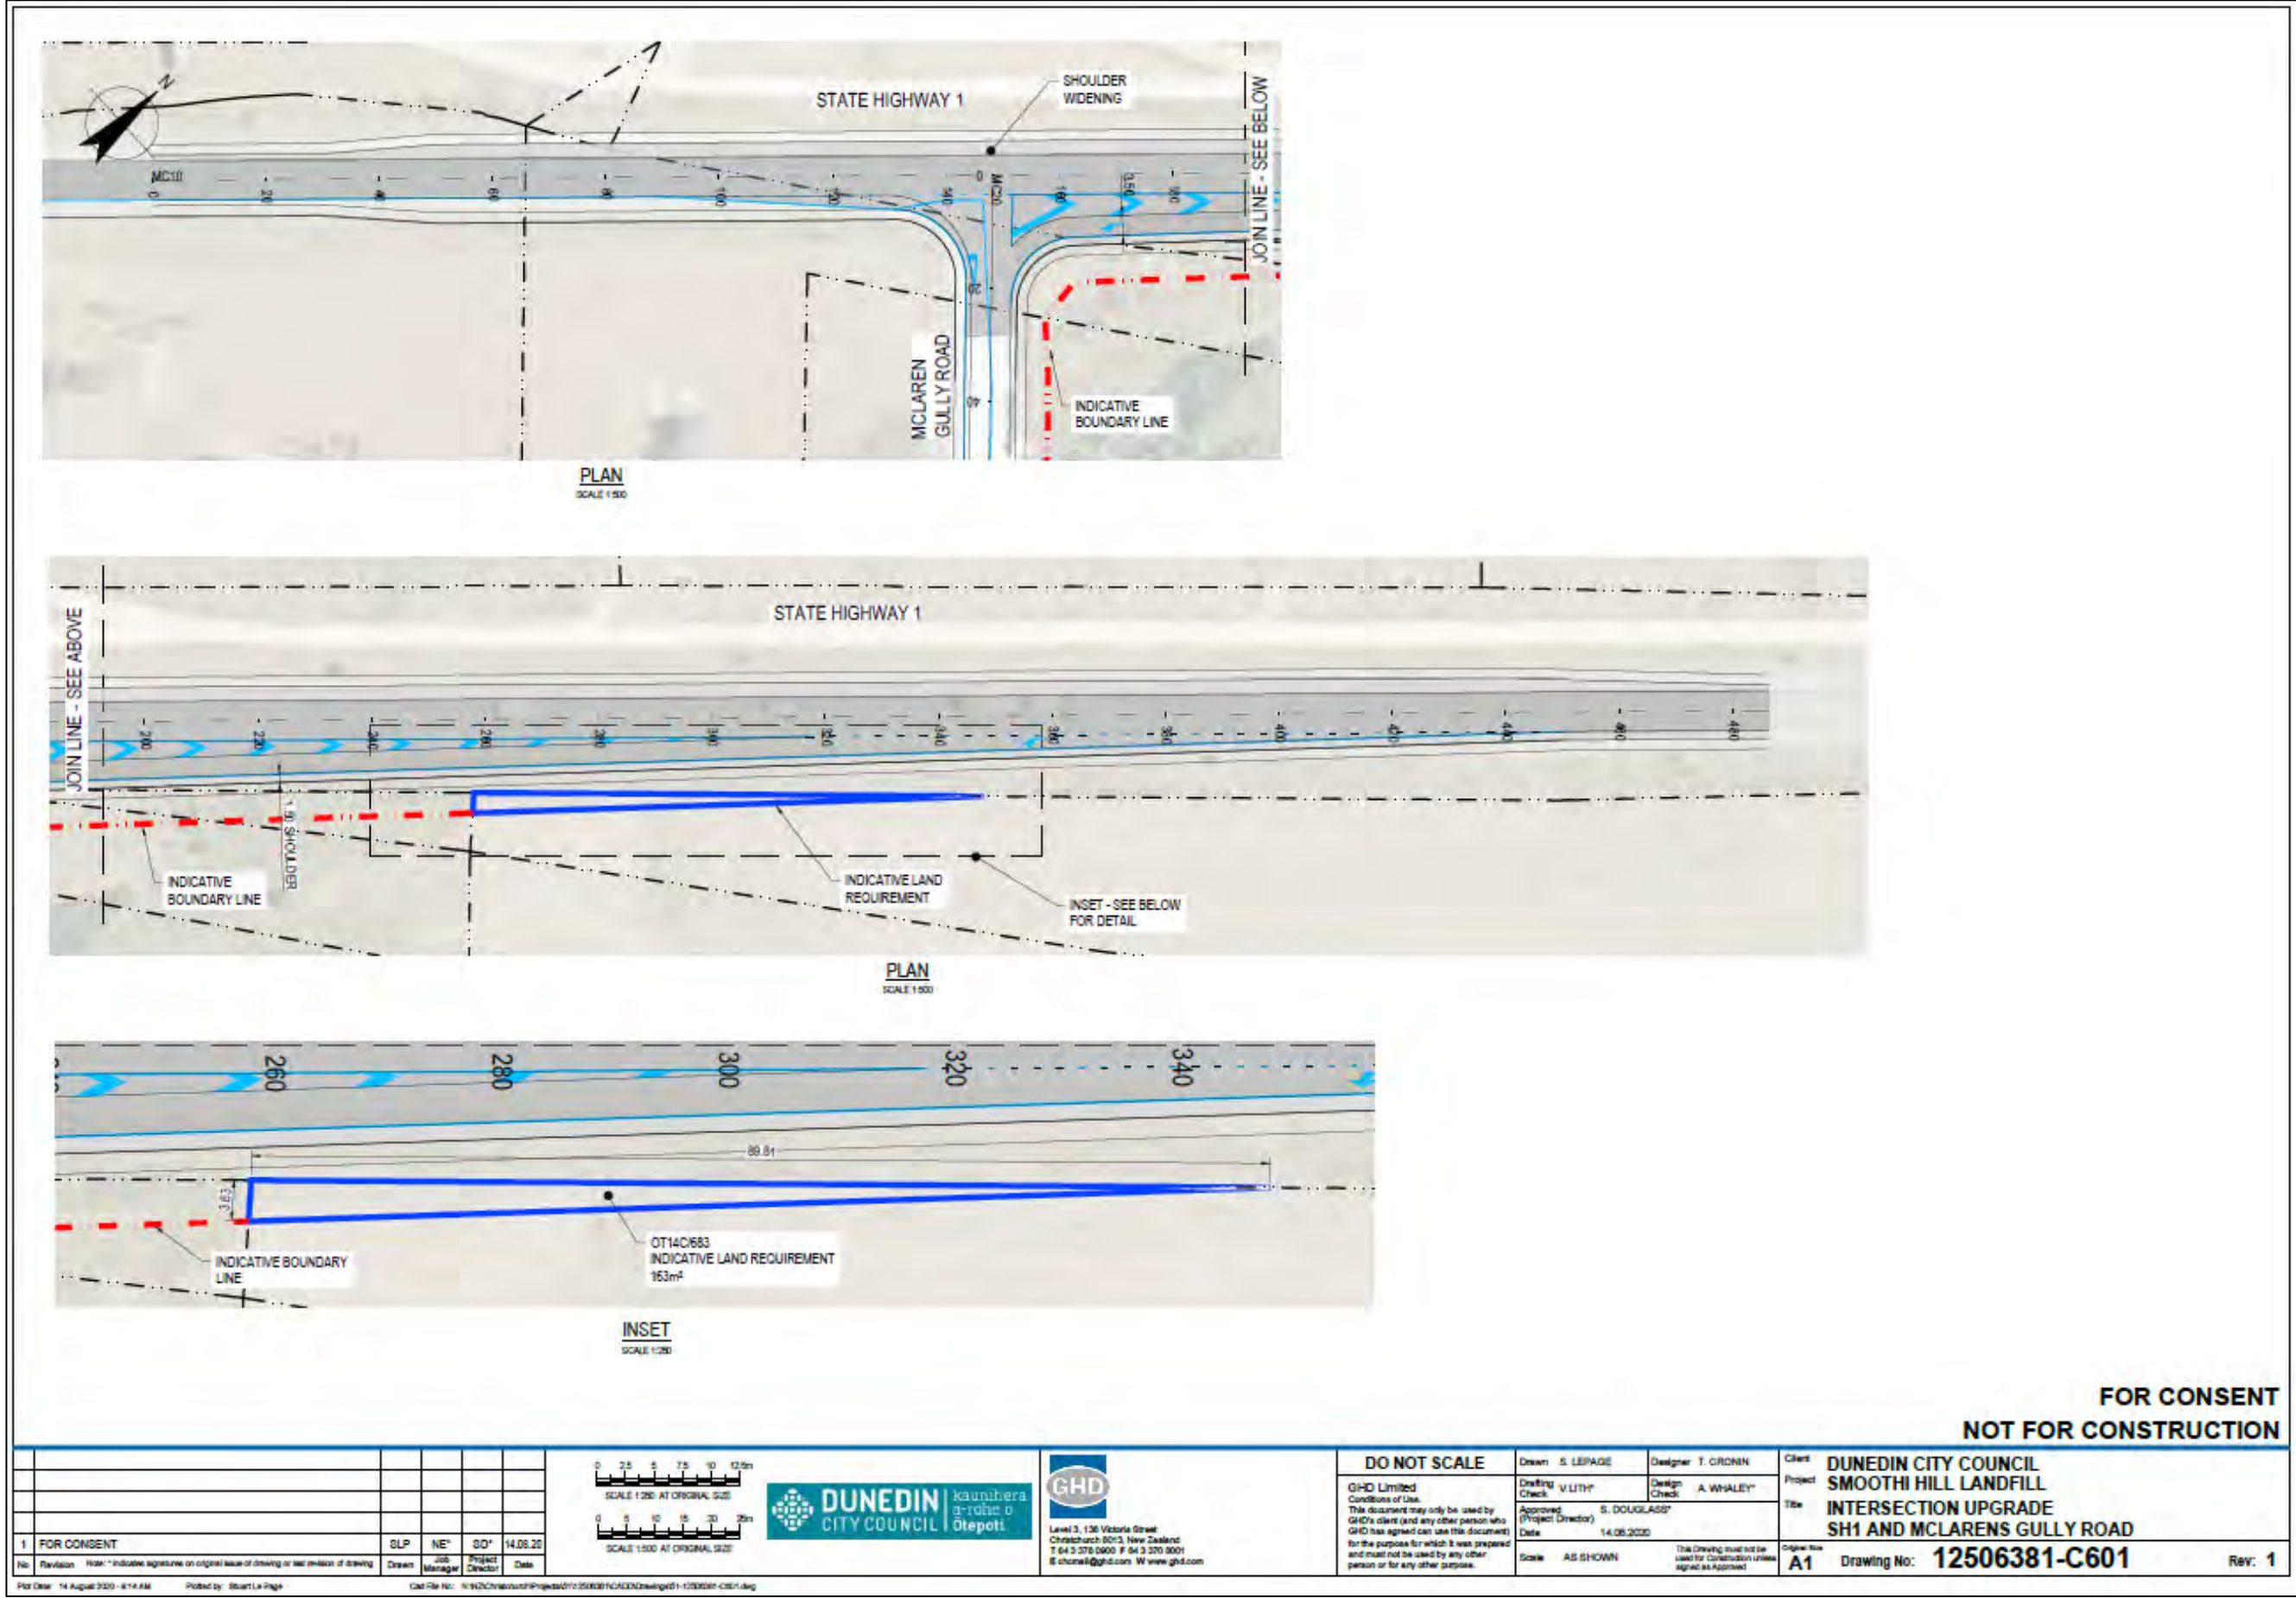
Plans provided by Boffa Miskell showing the proposed McLaren Gully Road and State Highway 1 Intersection.
